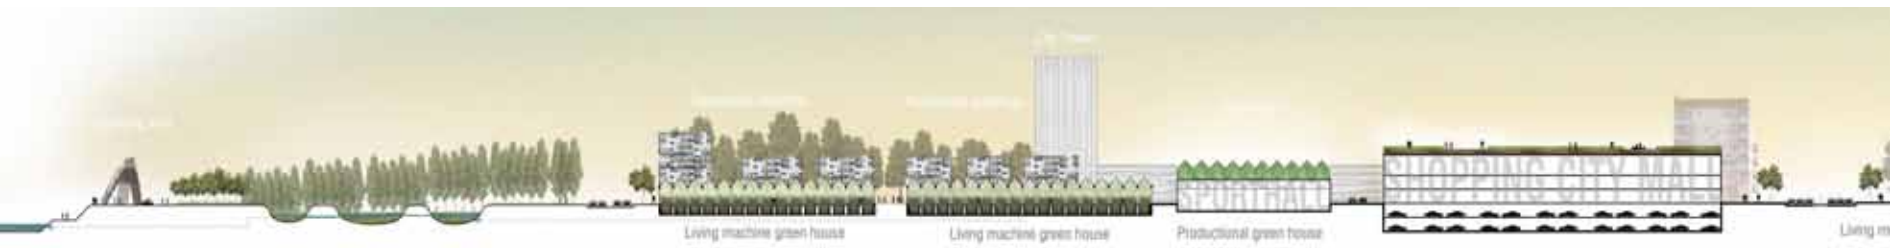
Long section- showing the integrated living machine green houses in the existing built context
